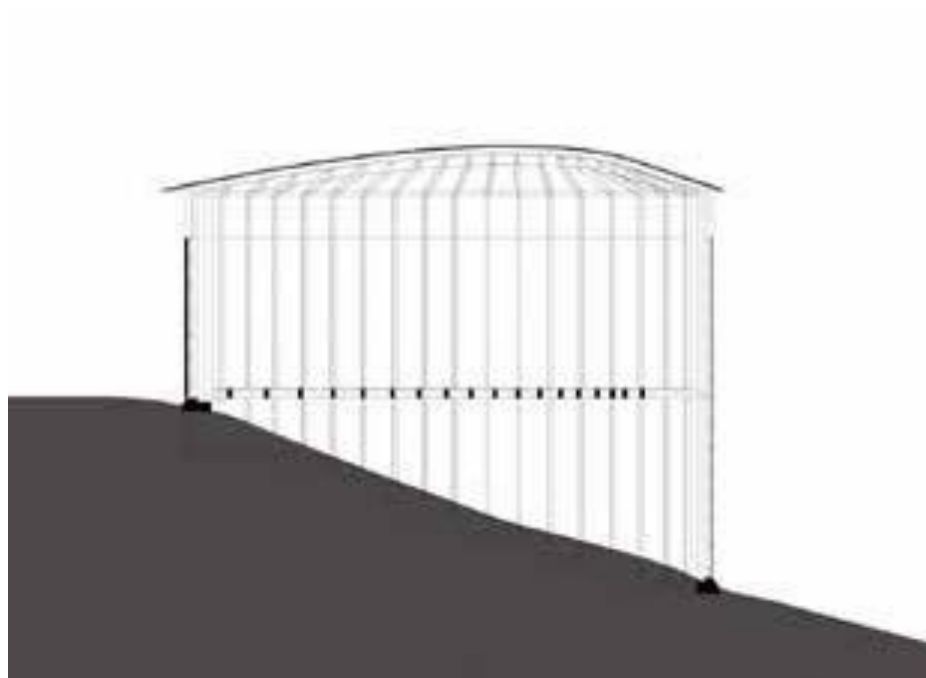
Cross Section. (Source: Kalvelage, 2016)
